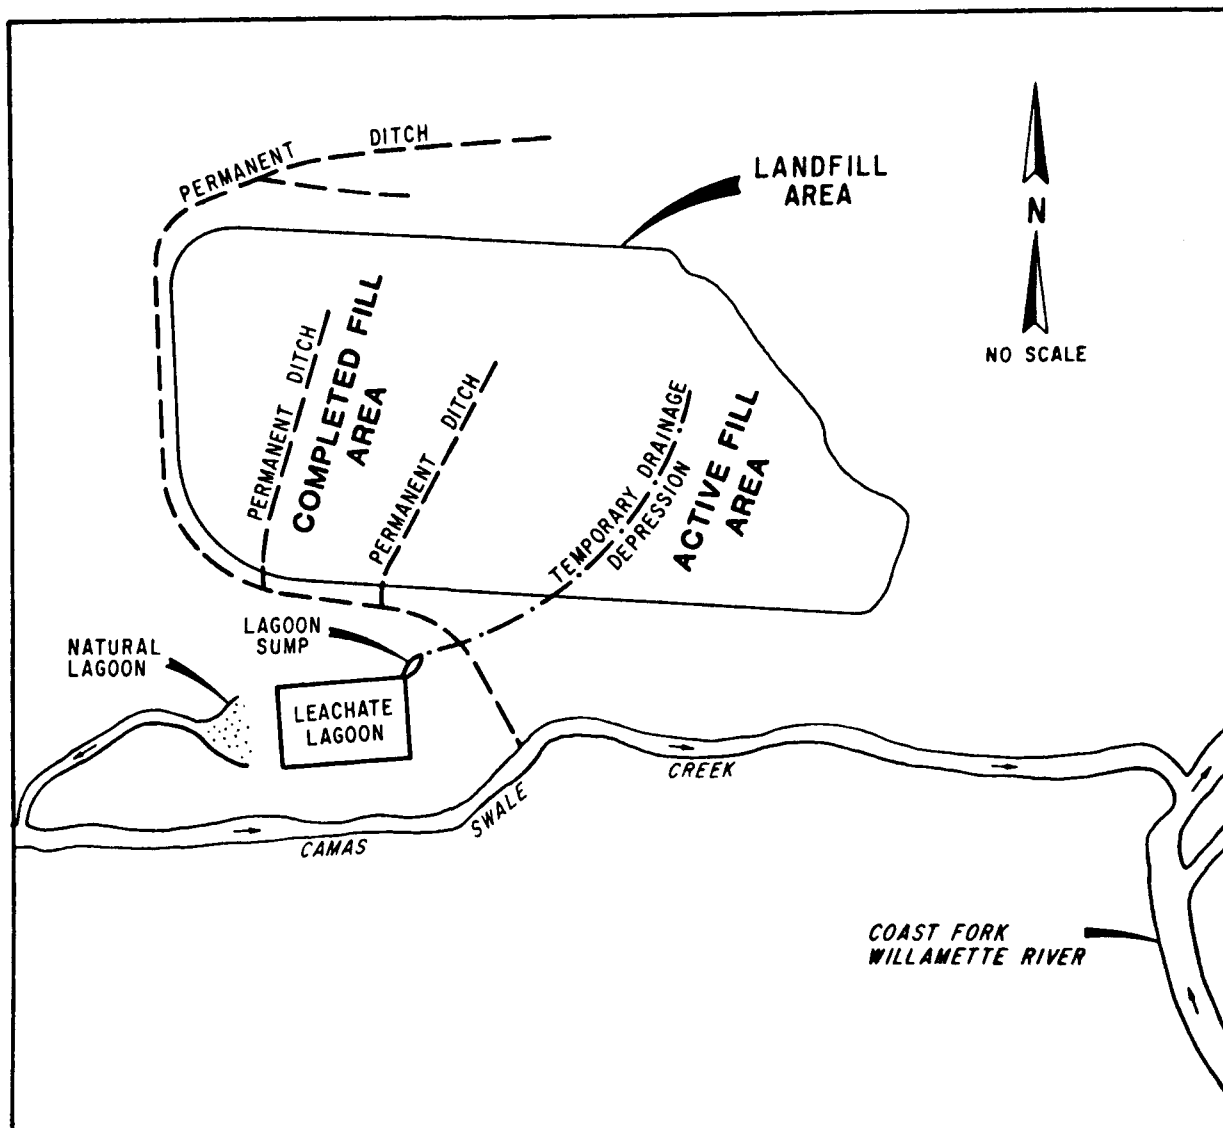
II. SURFACE DRAINAGE FEATURES AT SHORT MOUNTAIN LANDFILL
